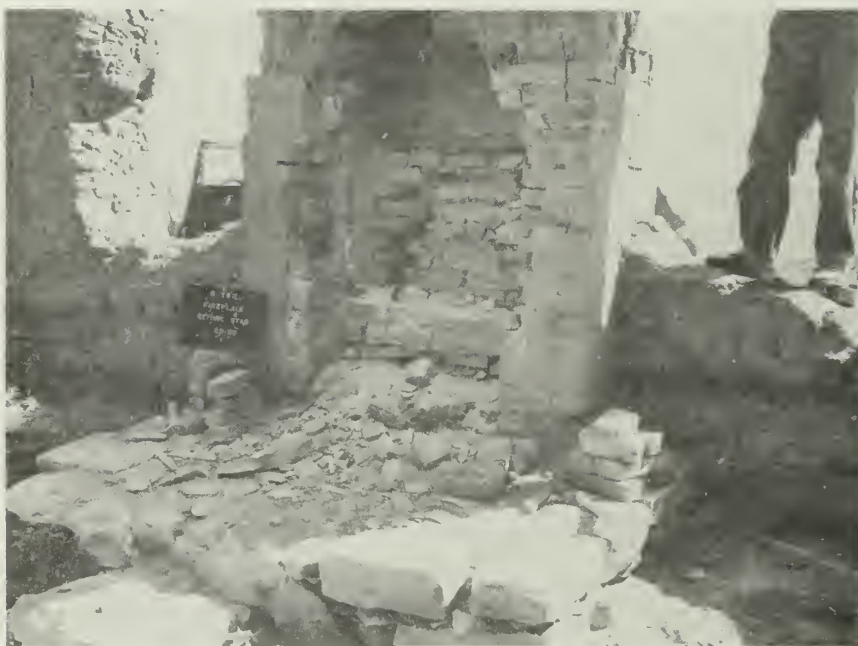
Building 6-160, Room 163, fireplace in east wall, before stabilization. Fort Union National Monument.
